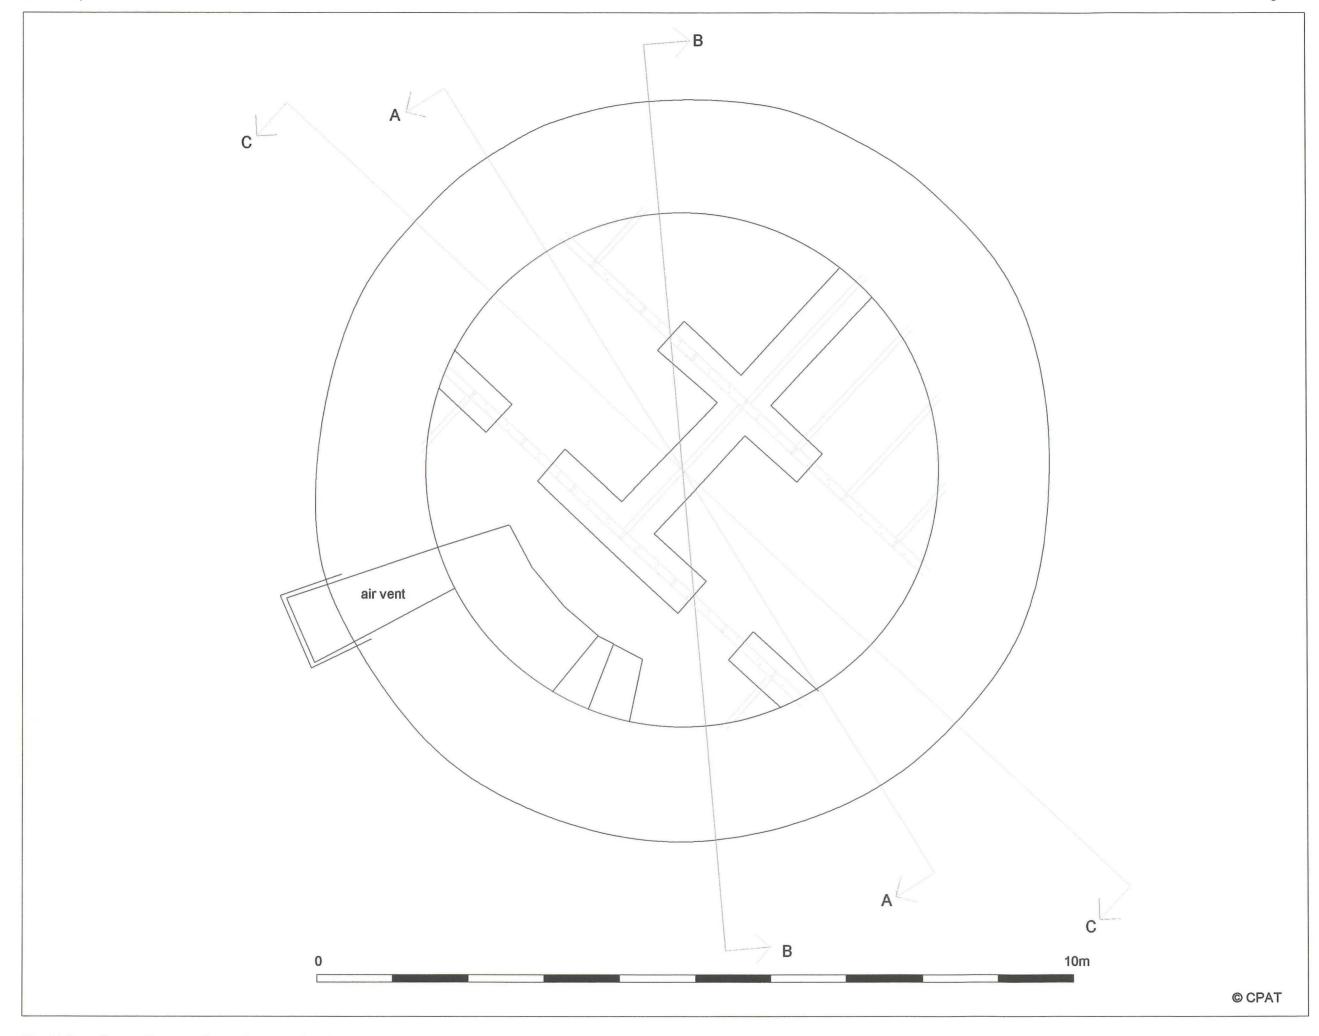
Roundhouse Farm north-east tower, cellar plan
